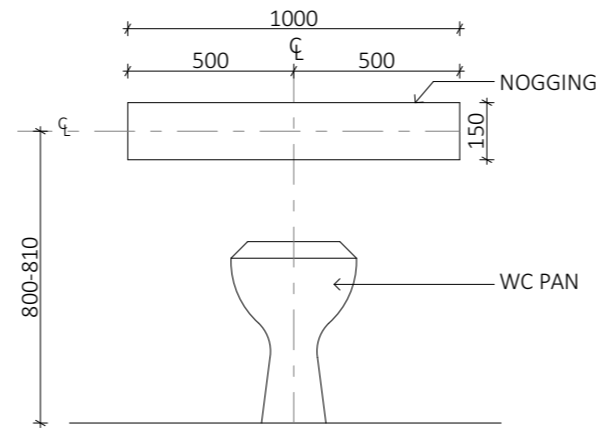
F - LOCATION OF NOGGINGS FOR A WALL BEHIND A TOILET PAN
